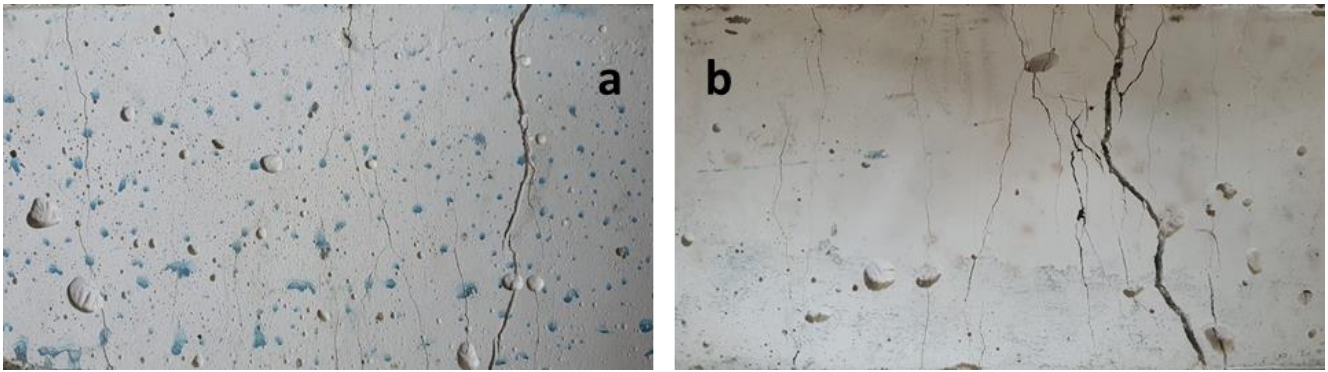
Multiple cracking of expanded glass (a) and rubber (b) containing beams after failure.
